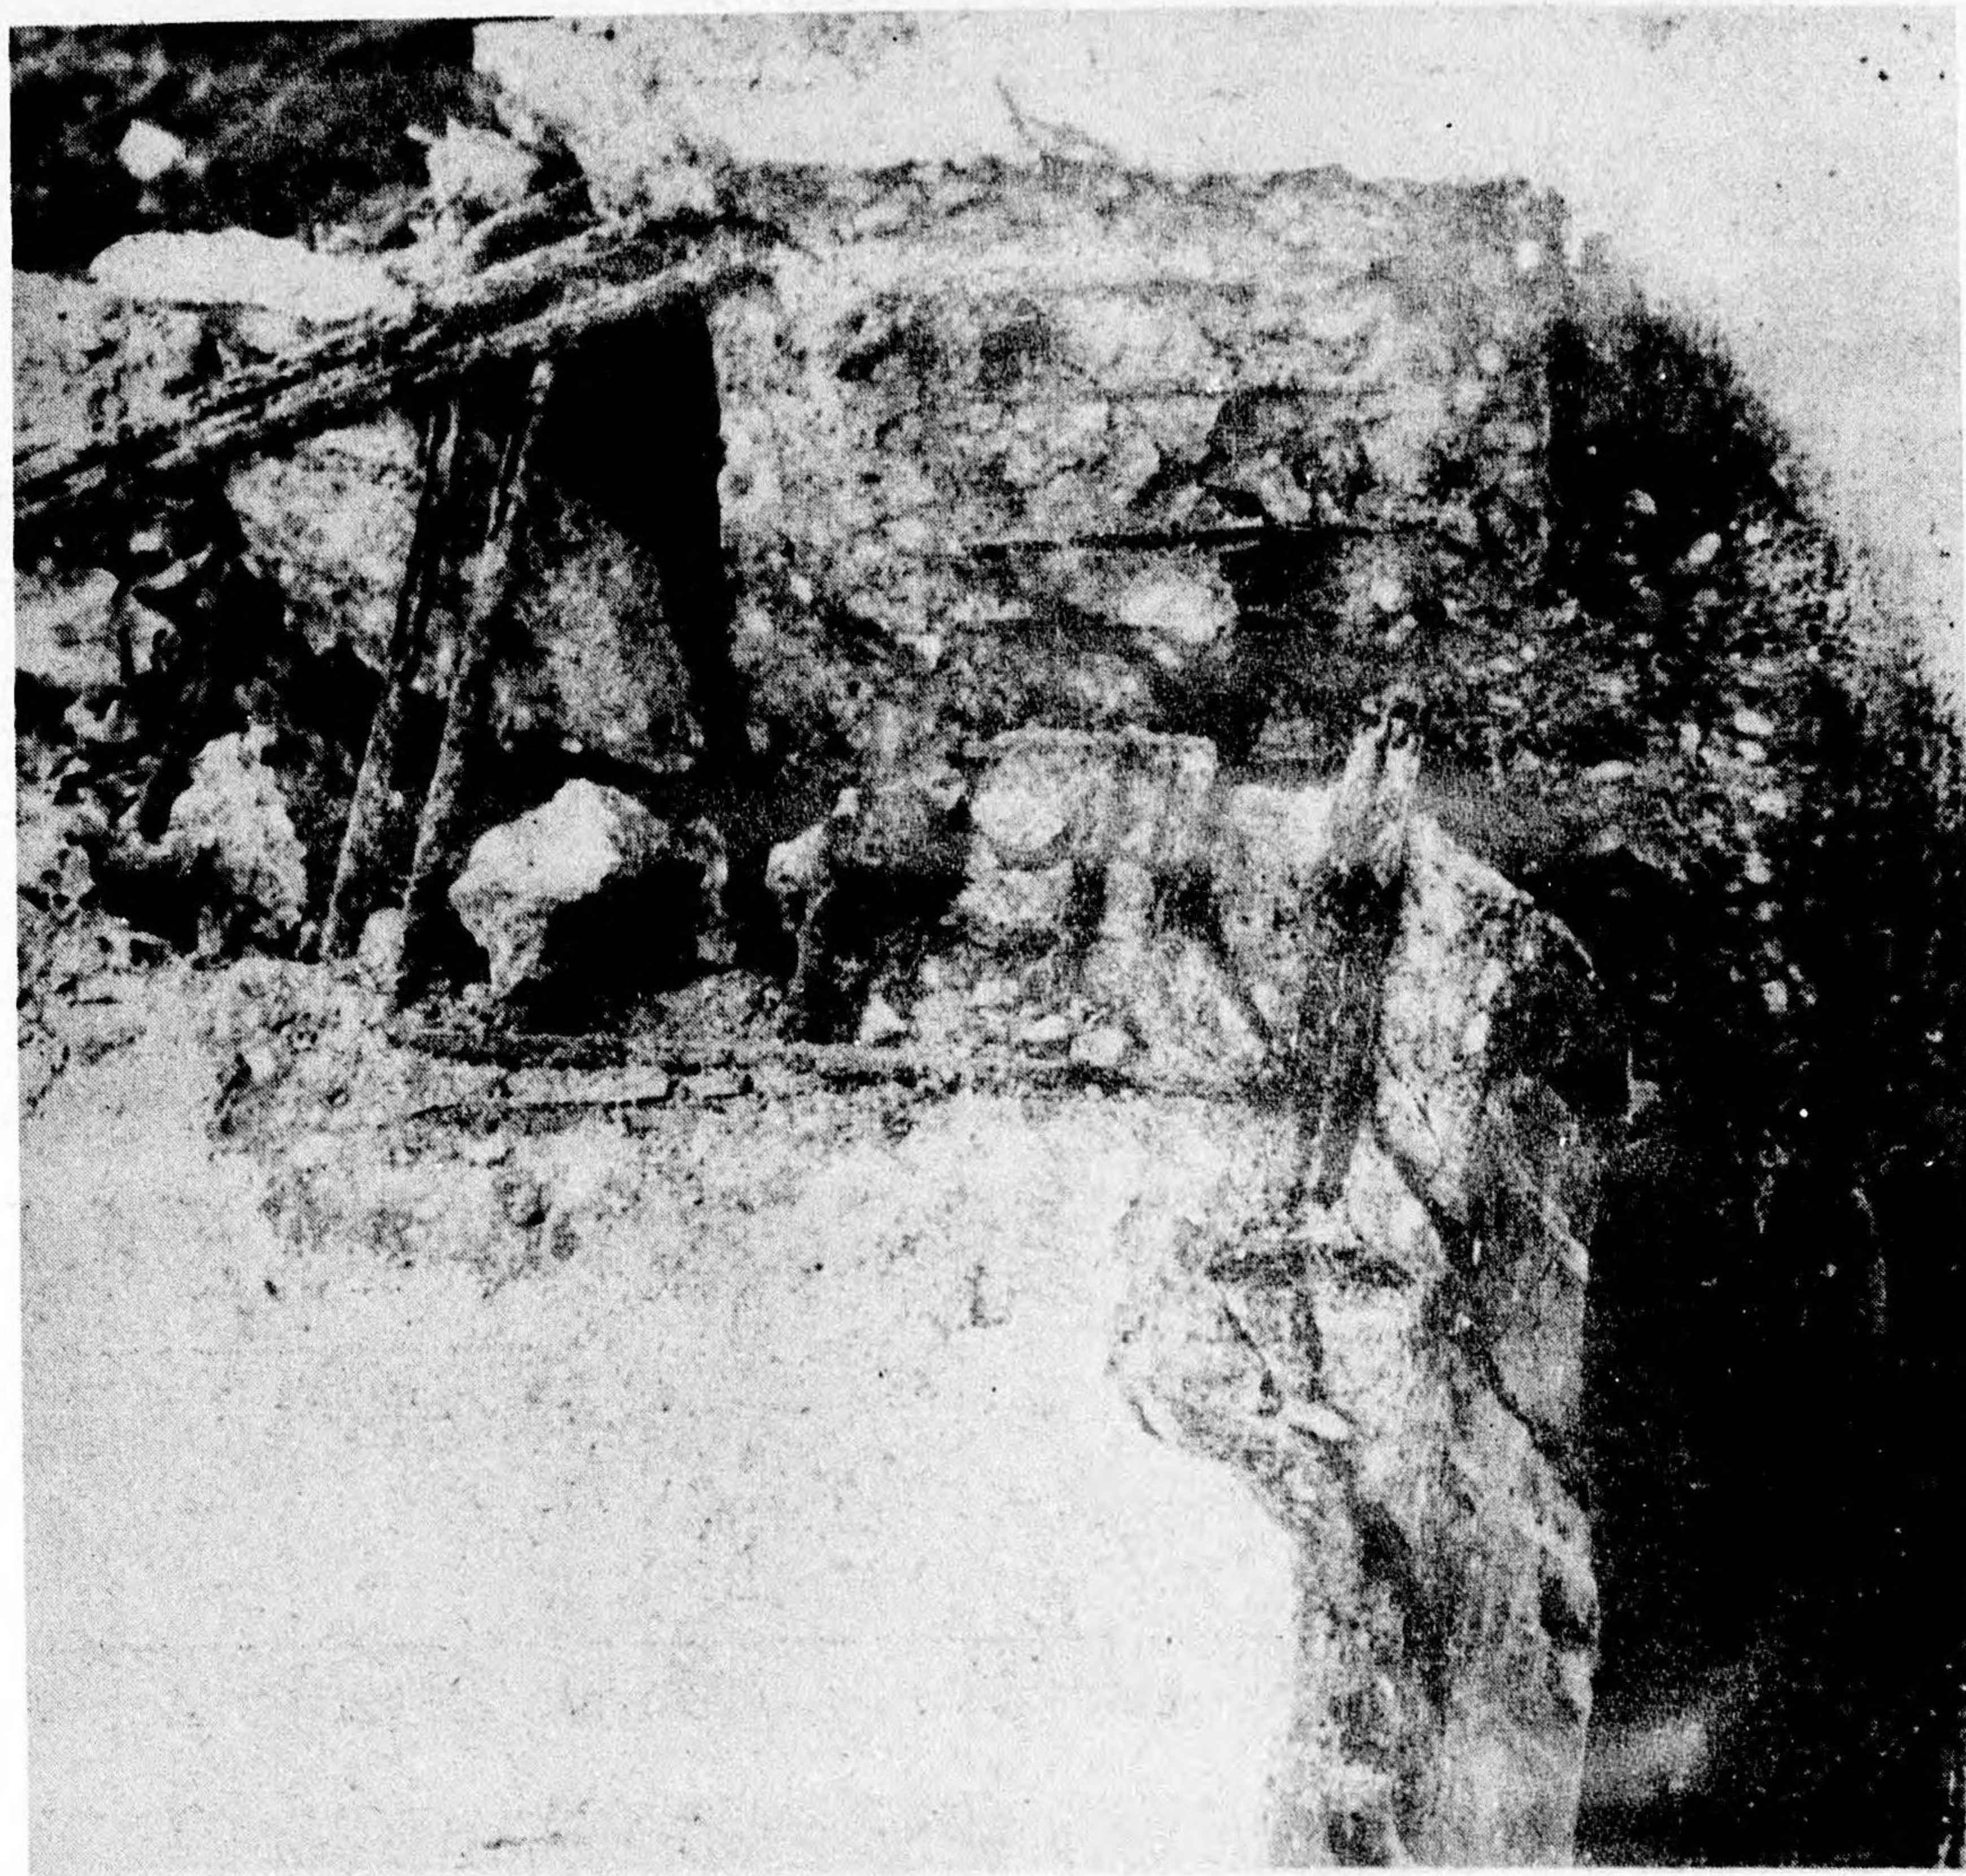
Close-up of west end of north, first floor spandrel beam after detonation of $\frac{1}{2}$ lb of TNT. Several bars failed in tension at this point and some pulled out because of insufficient bond.
